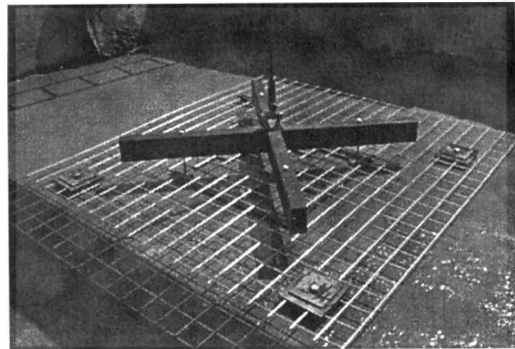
Photograph showing arrangement of mesh and bolts and load frame raised by bolts passing from near the corners to the cross-head.
